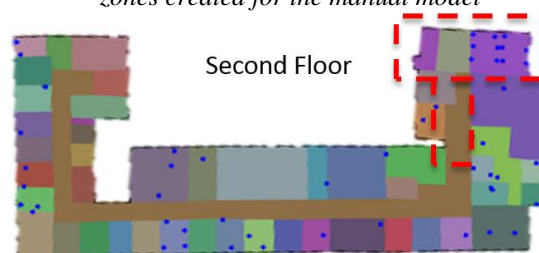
Second floor plan showing the thermal zones created for the RAPMOD model
